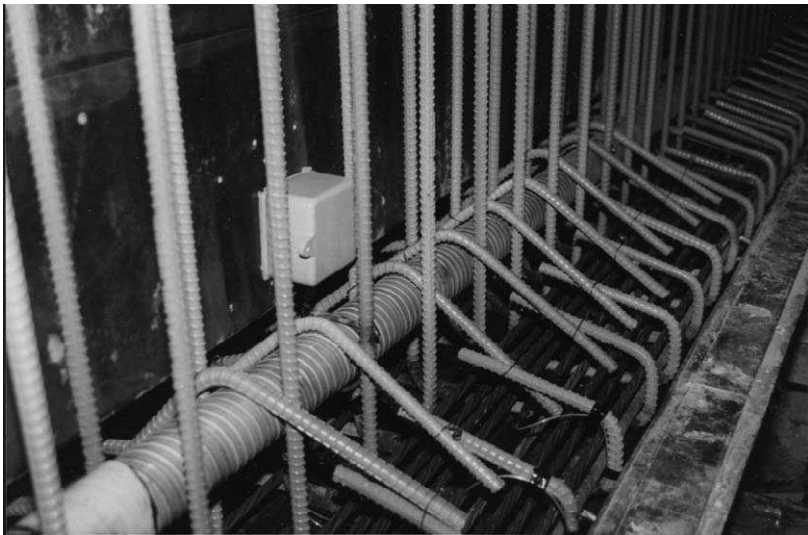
One of the recessed metal outlet boxes used to house and protect the optical fiber leads during concrete pour for one of the Beddington Trail Bridge girders.
